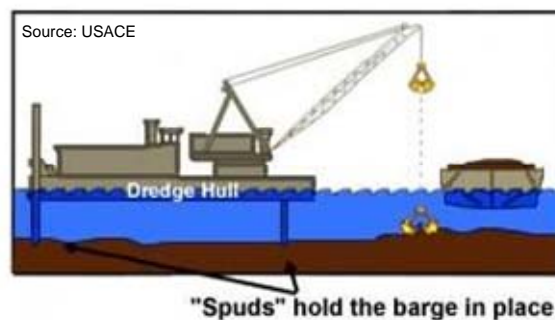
Typical Mechanical Dredge (Clamshell Bucket) with Bottom Dumping Barge
